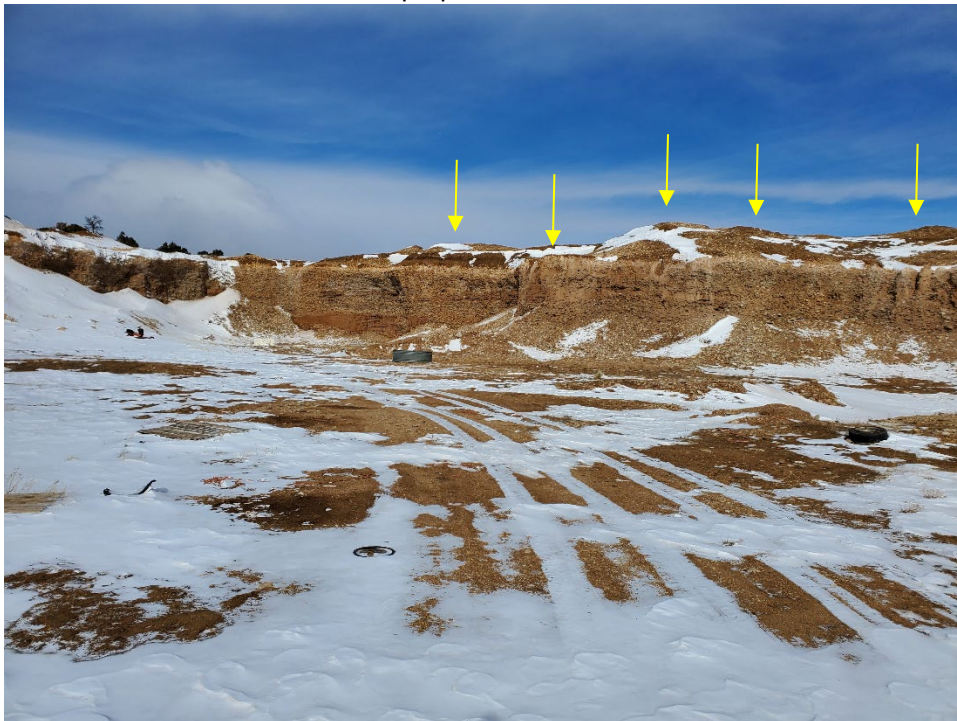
Looking at the north-west corner of the pit. Arrows indicate where overburden is stored above the highwalls.
